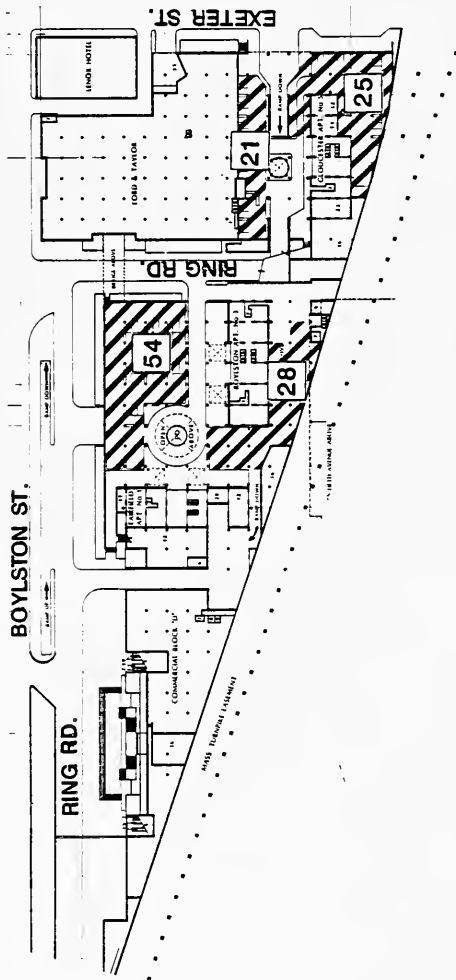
A Parking Layout North Garage Mezzanine Level
